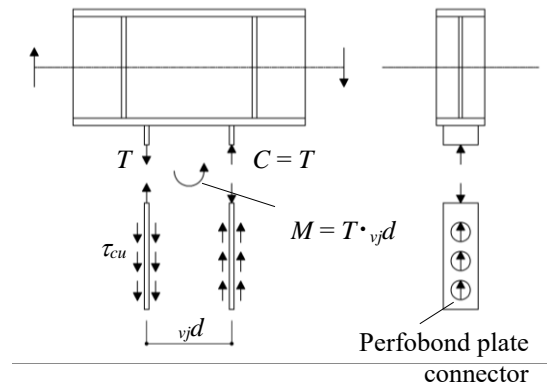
Bearing resistance mechanism of perfobond plate connector
